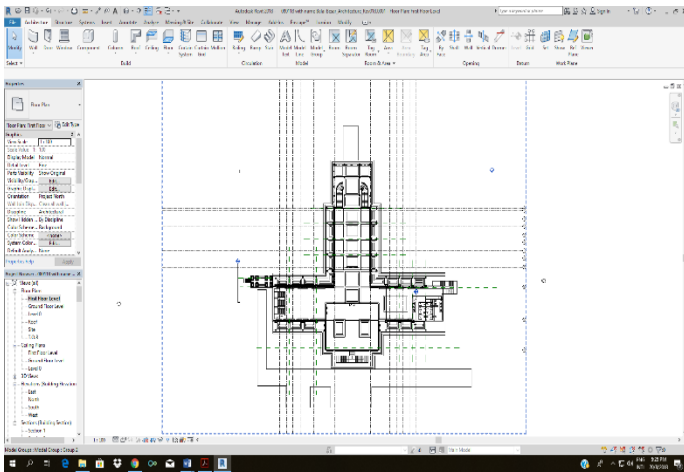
Building layout converted from point clouds to BIM using Revit (Authors, 2019)
